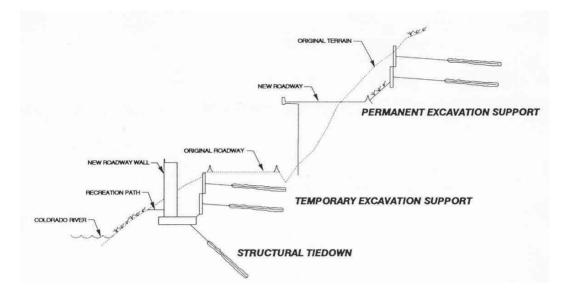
Anchor/wall configuration, from Kracum, (1993).
